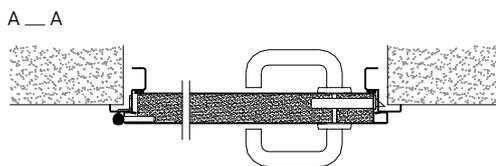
Horizontal cross-section of the ECO BASIC external steel seamless door with a corner frame
